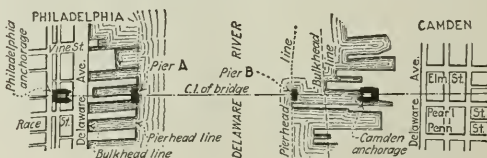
LOCATION PLAN OF PIERS AND ANCHORAGES
